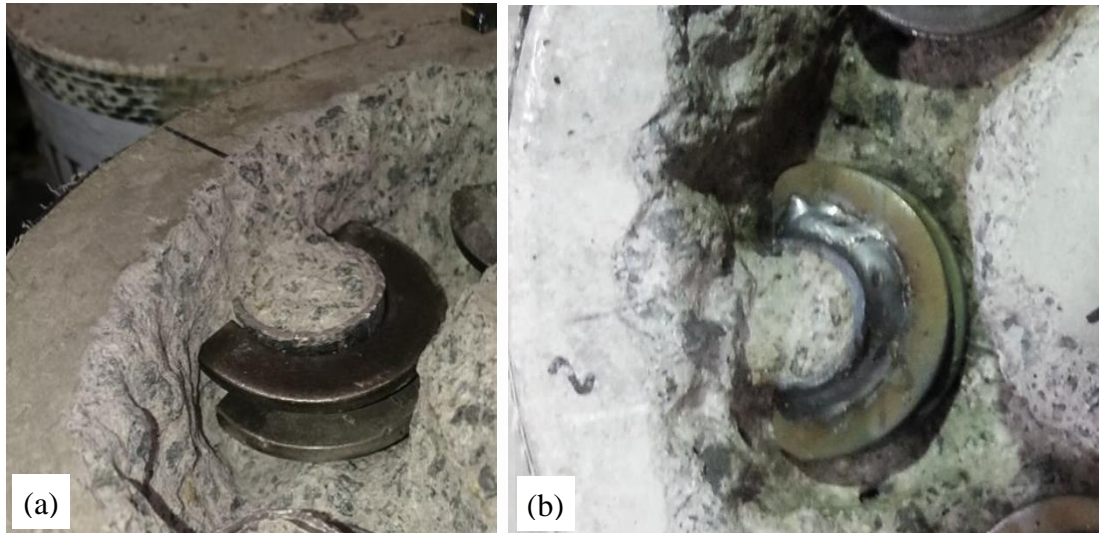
Configuration of two washers: (a) washers before welding; (b) washers after welding
